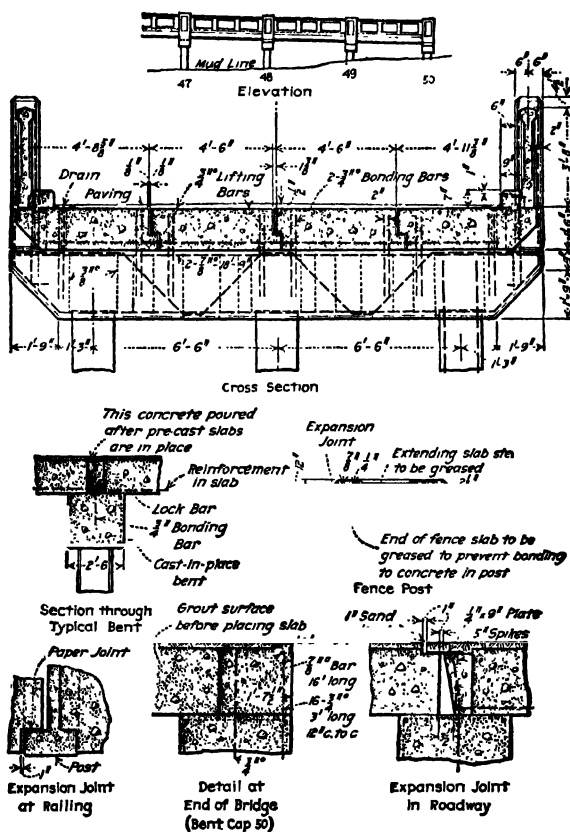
Details of pile trestle across the Miles River near Easton, Md.
